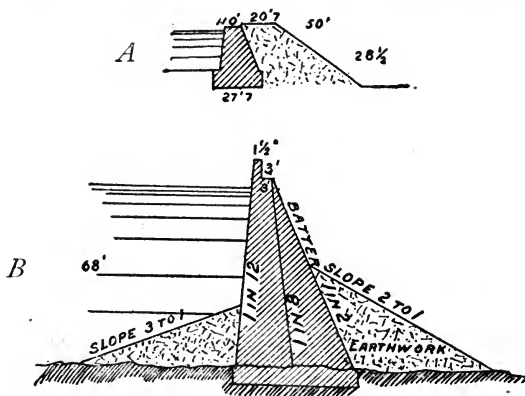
CROSS-SECTIONS OF KABRA DAM (A) AND EKRUK DAM (B), INDIA.
